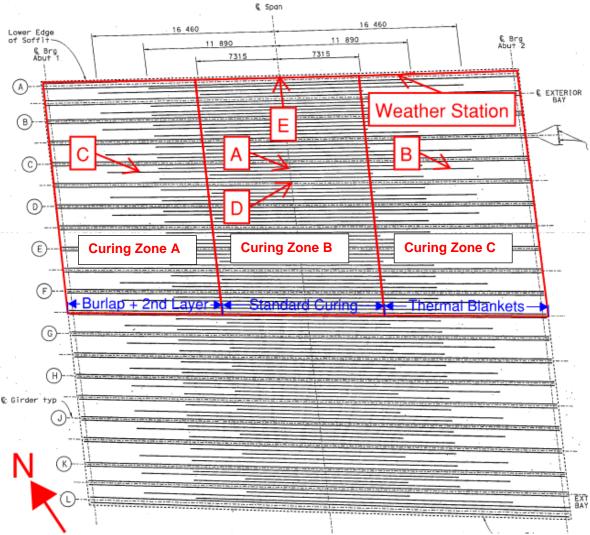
Weather Station and Instrument Locations, and Curing Method Areas on the Olive Lane Bridge.
